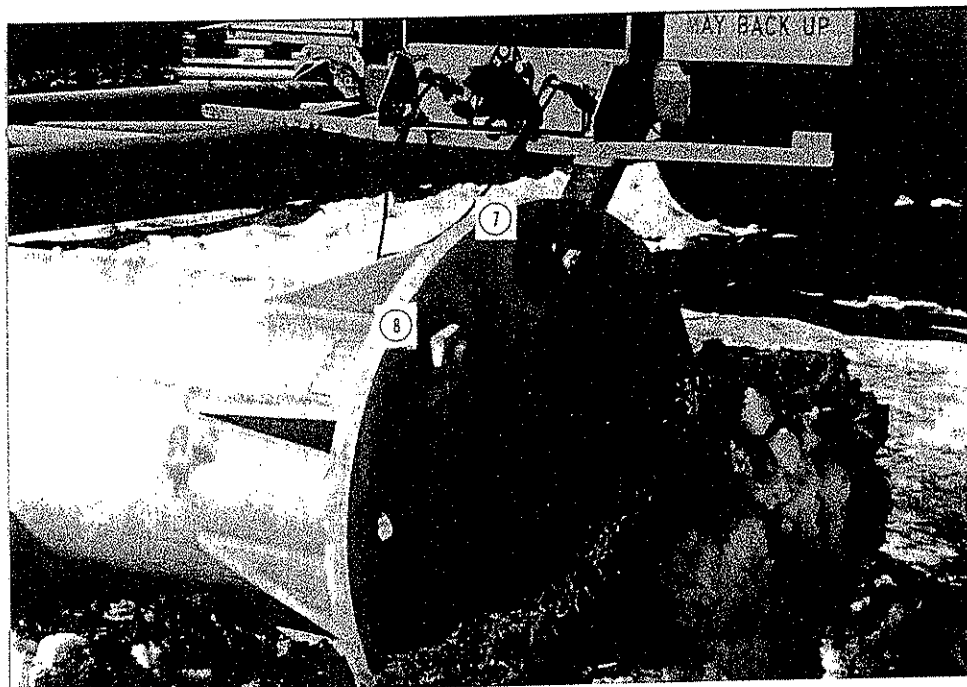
Close up of Fractured Anchor Bolts.
